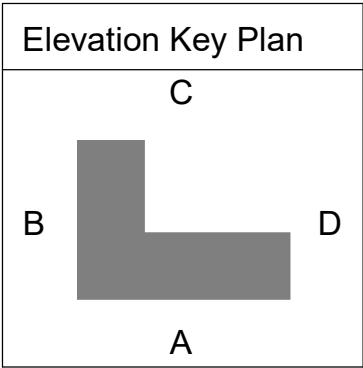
MULTIFAMILY ELEVATIONS
